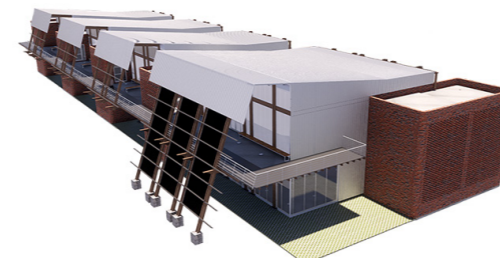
PHASE 4 - DANPALON POLLY CARBONATE GLAZING. KLIPLOCK 406 ROOF SHEETING, WITH STEEL SUB-FRAME, DRYWALLS & INSULATION. (Author 2018).
